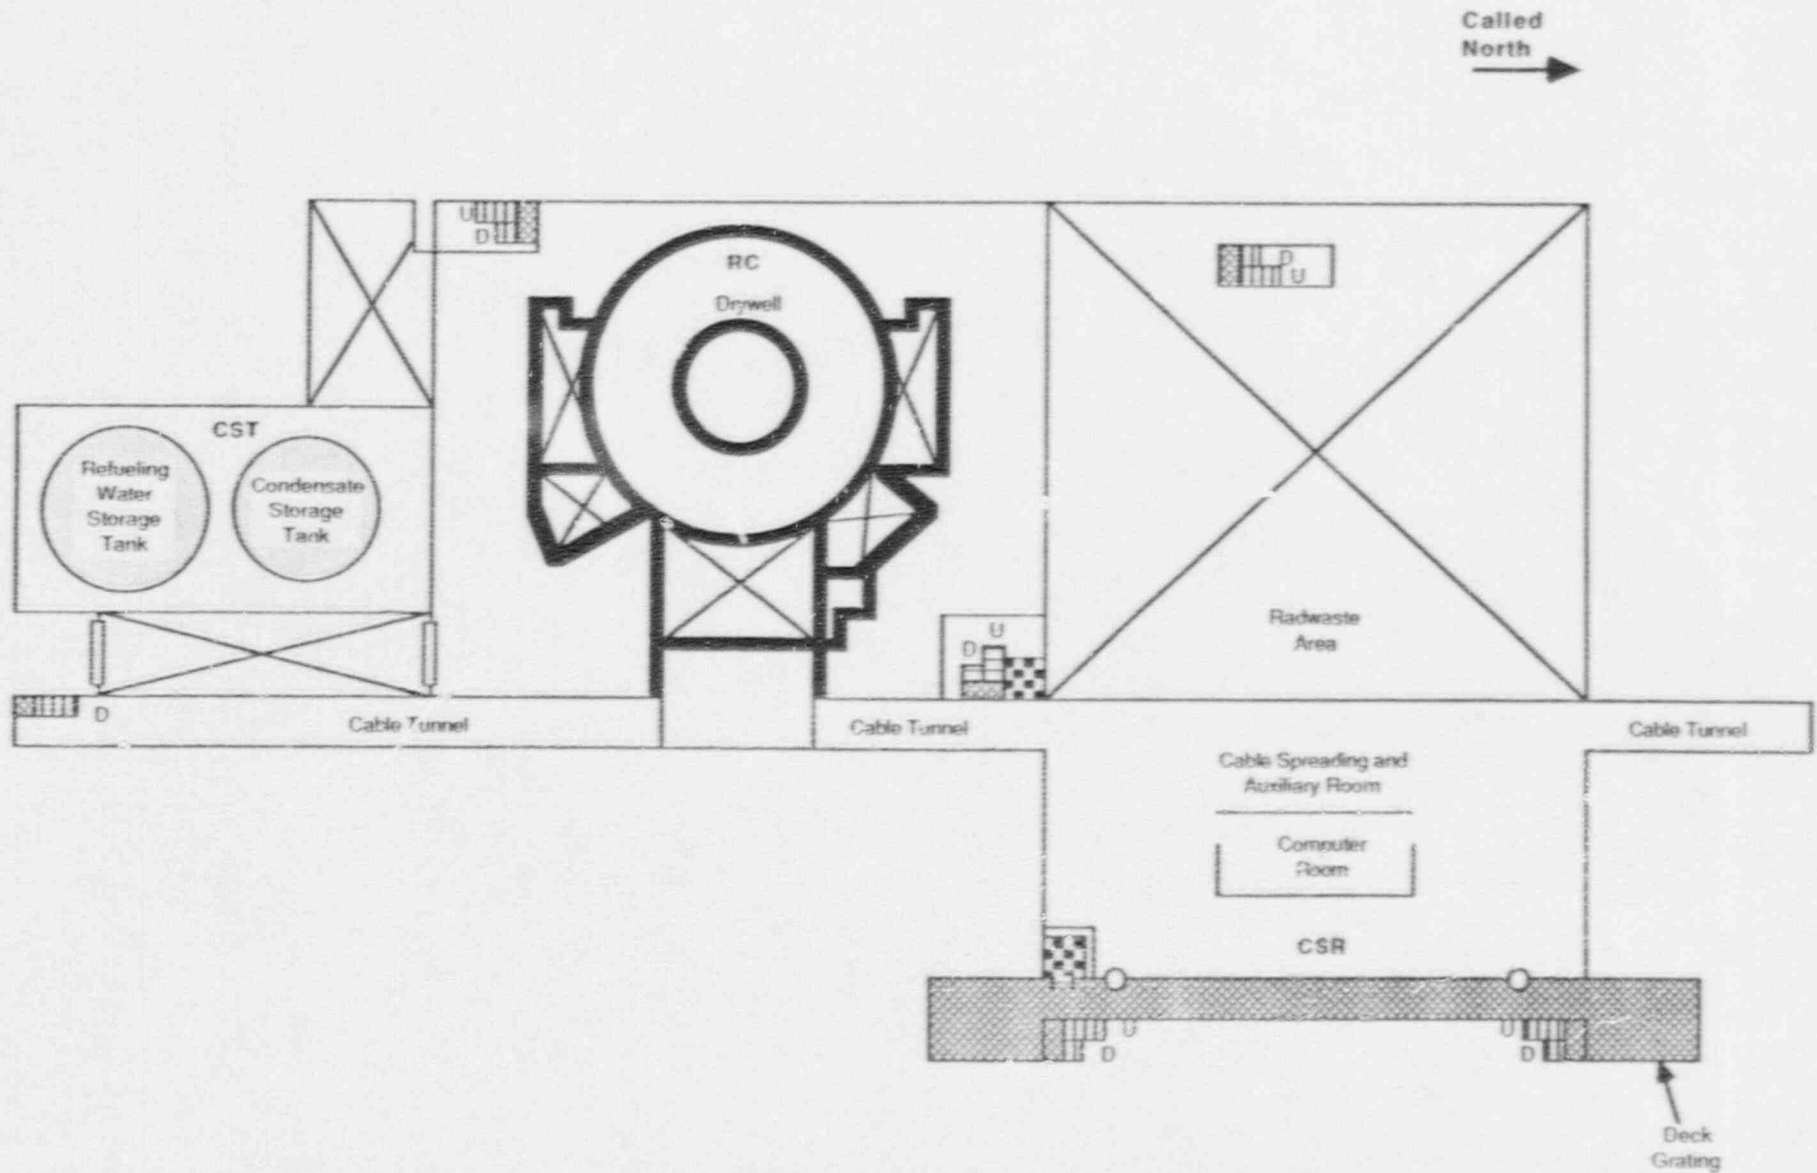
Peach Bottom 2 Reactor and Radwaste Building and Unit 2/3 Cable Spreading Room, Elevation 150'0"
